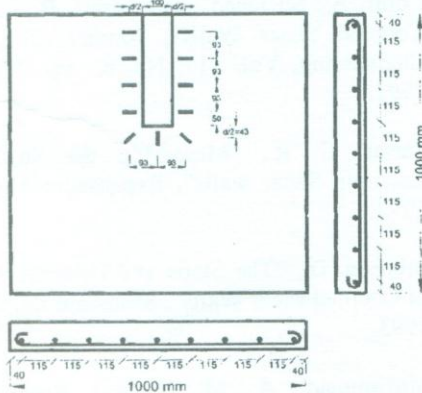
Arrangement of reinforcement and Location of I-sections of the model
